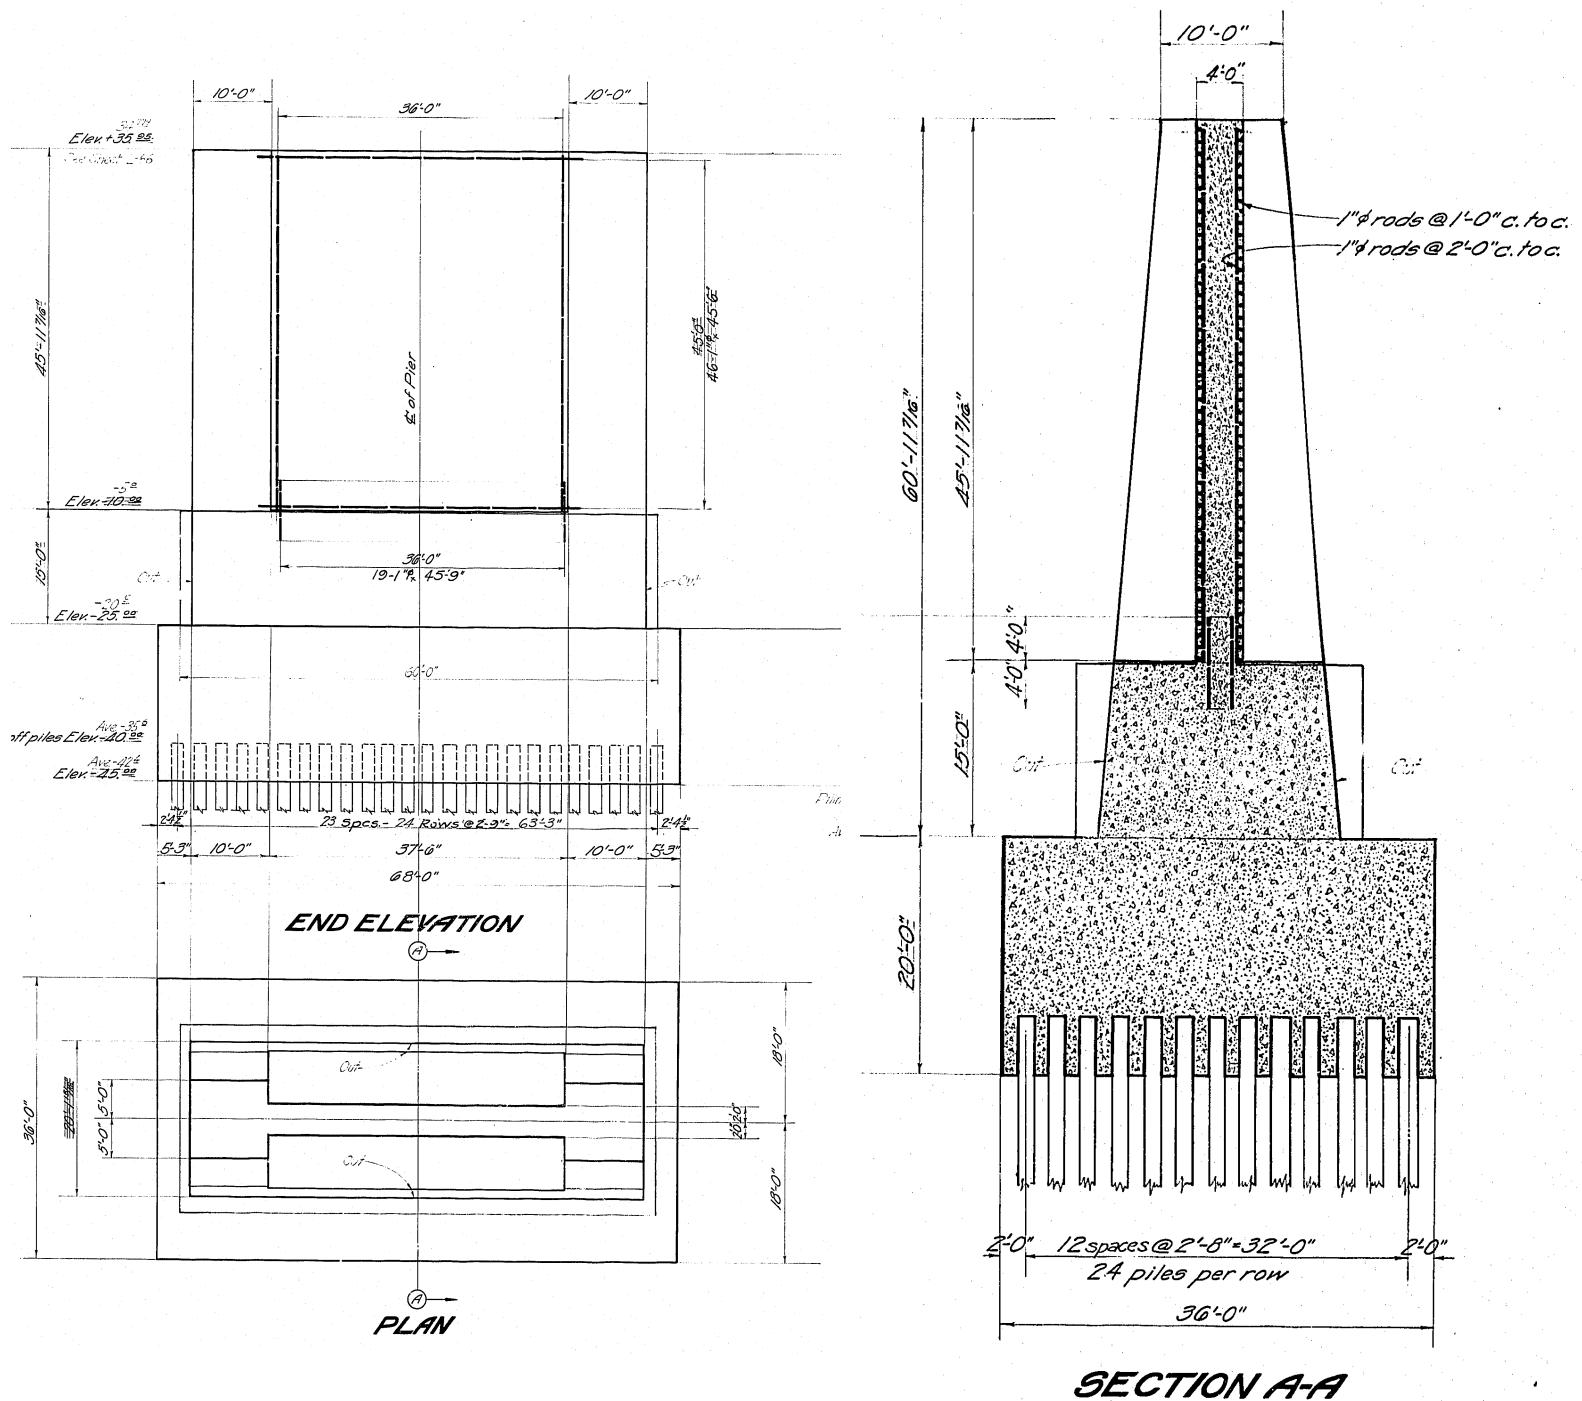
Burnside Bridge Fixed Spans Piers 1 & 4, foundation piles (outer piles) in uplift, in bridge longitudinal direction
